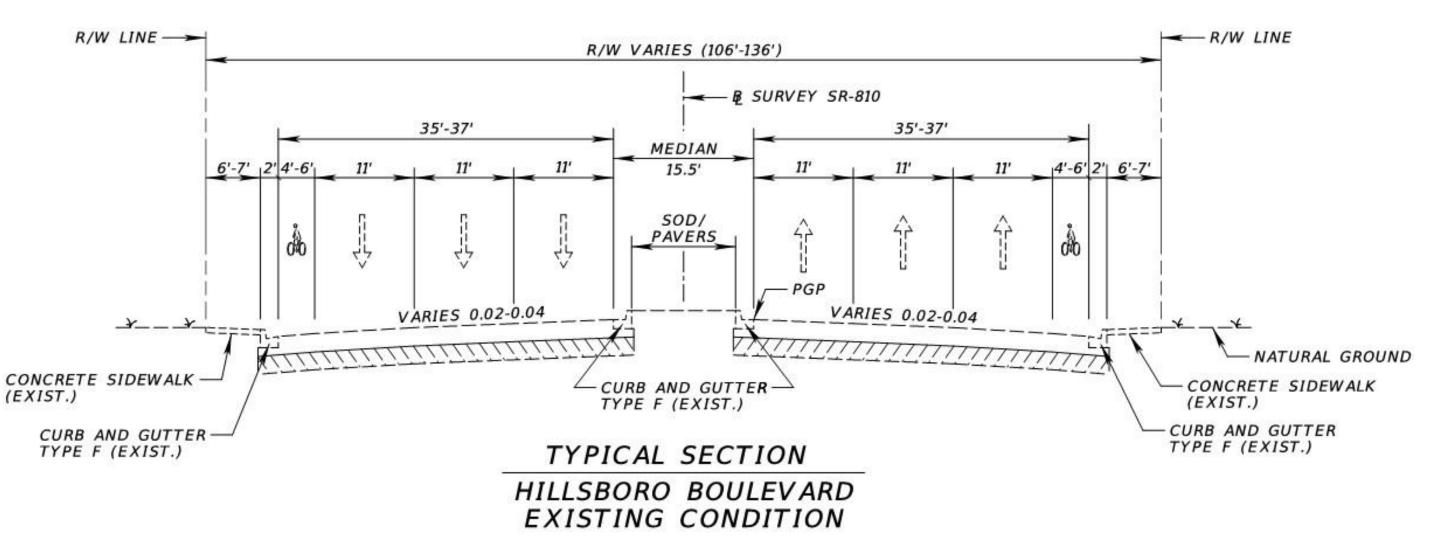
6:Existing Typical Section – Hillsboro Boulevard
